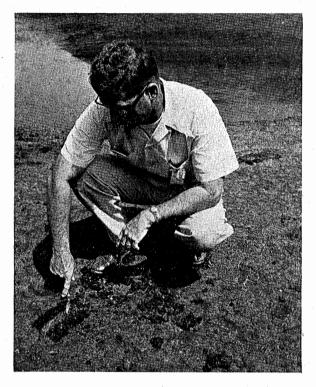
Test Hole Showing Extent of Oil Penetration into Reservoir Floor.
